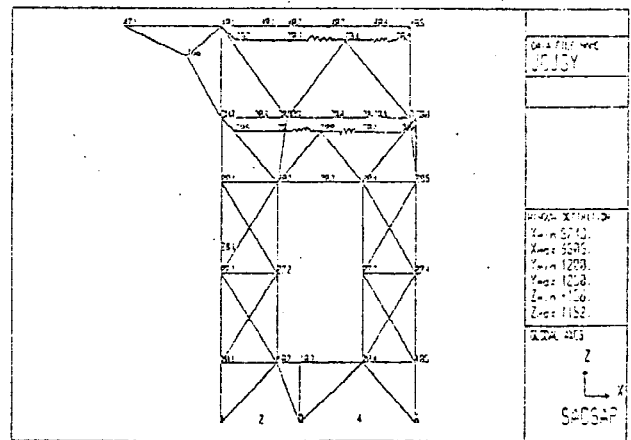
D TRANSVERSE FRAME DAMPER LOCATION
